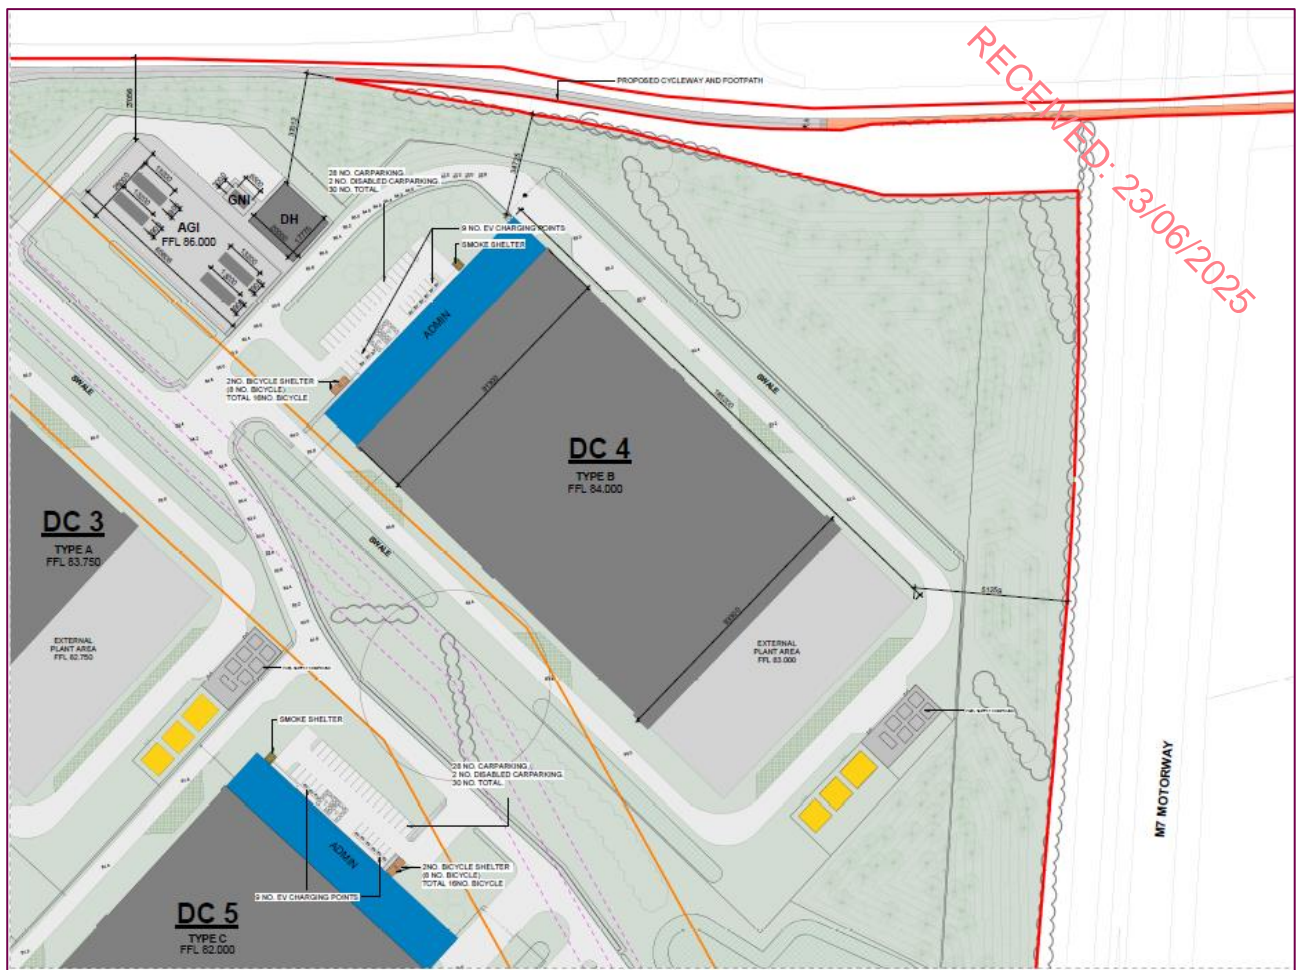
Previously Submitted Proposed Site Plan B (extract of submitted drawing 22217-RKD-ZZ-ZZ-DR-A-1012-PROPOSED SITE PLAN B)
